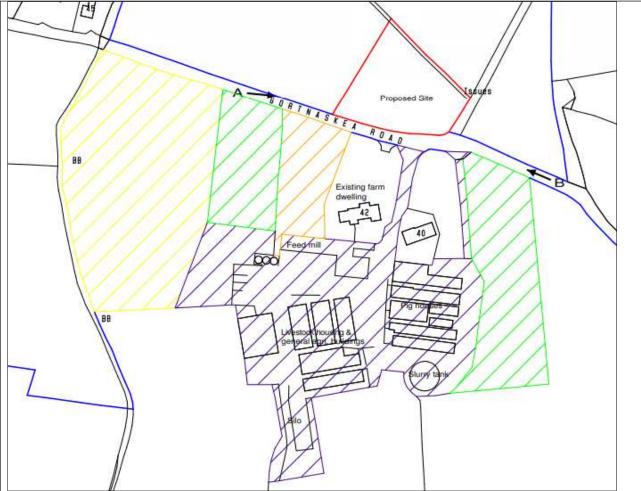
Concept Plan – field used for farm wastewater irrigation (yellow); farm expansion (green); field not suitable due to proximity to feed mill (orange); and extent of existing farm (purple).
